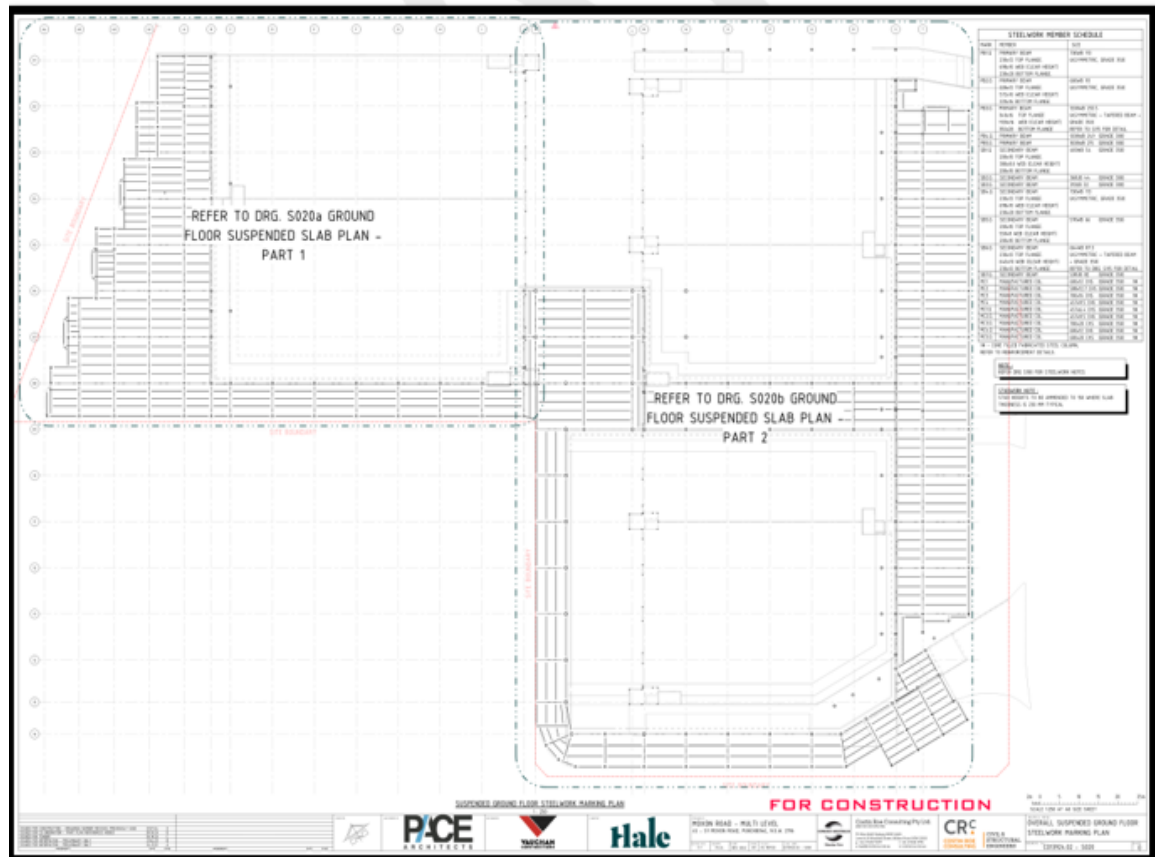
Overall Structural Suspended Ground Floor Steelwork Plan CO13924.02-S020 showing the arrangement of steel members forming the suspended structure above the flood conveyance zone
